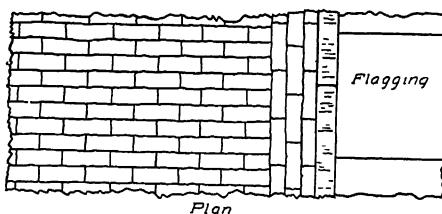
Plan of Stone-Block Pavement Showing Method of Laying Blocks
